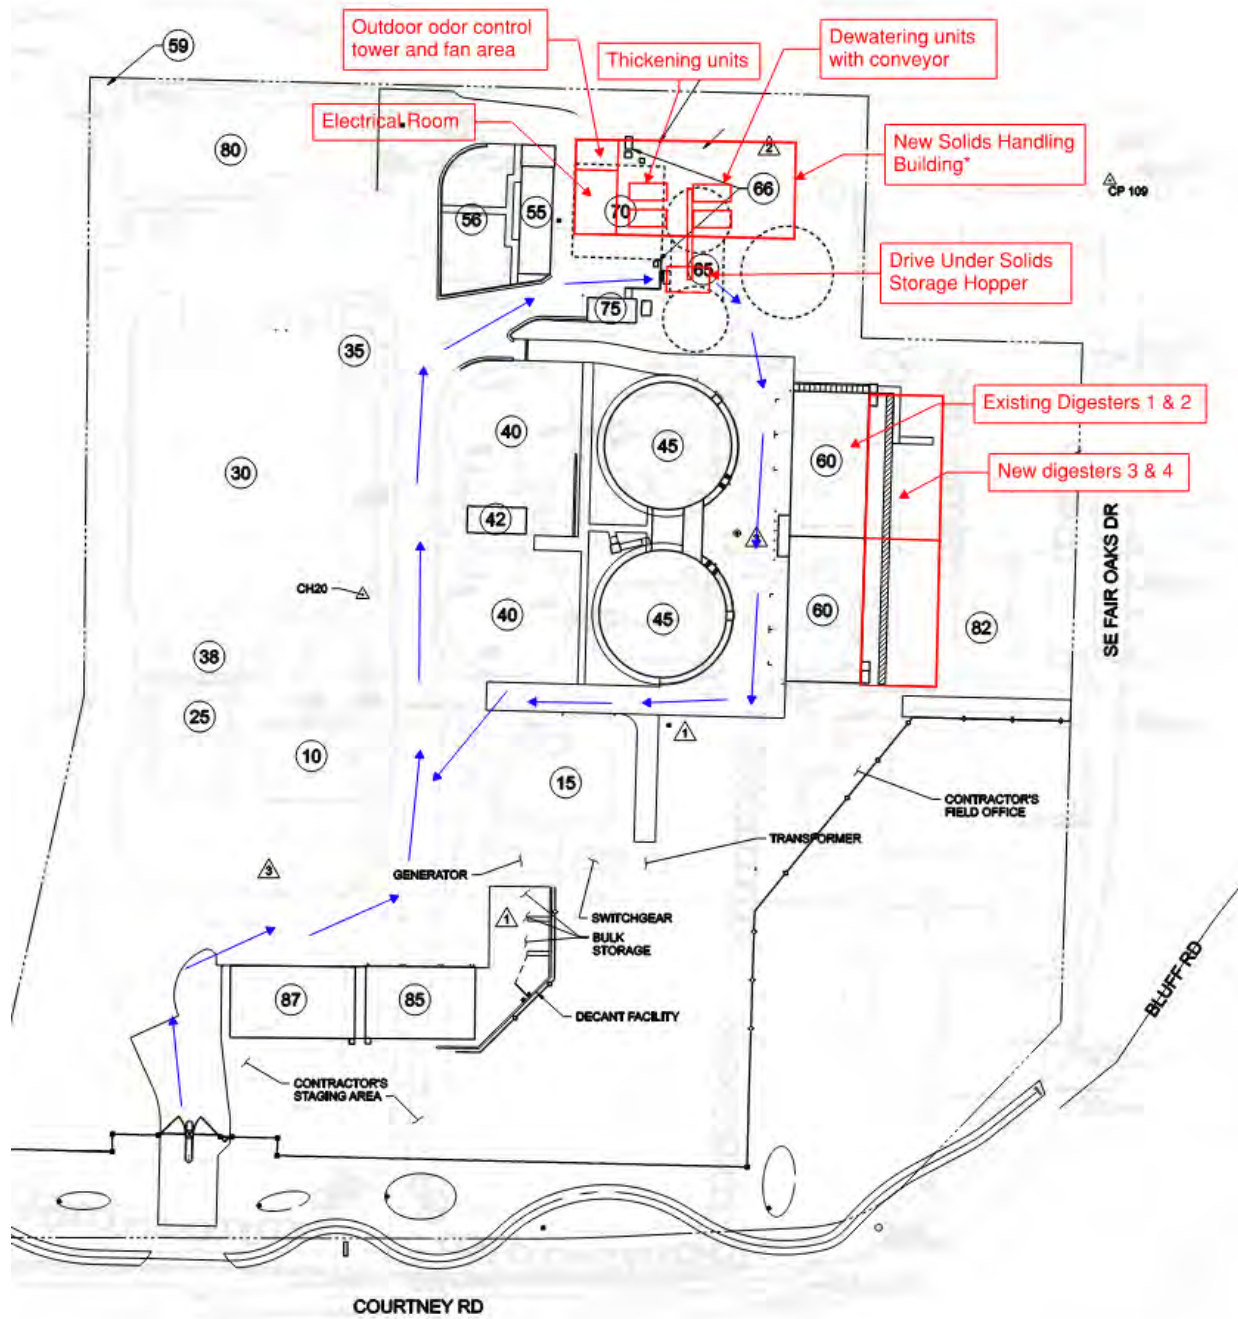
Alternative 1 - North Solids Handling Facility and Expansion of Rectangular Digesters
